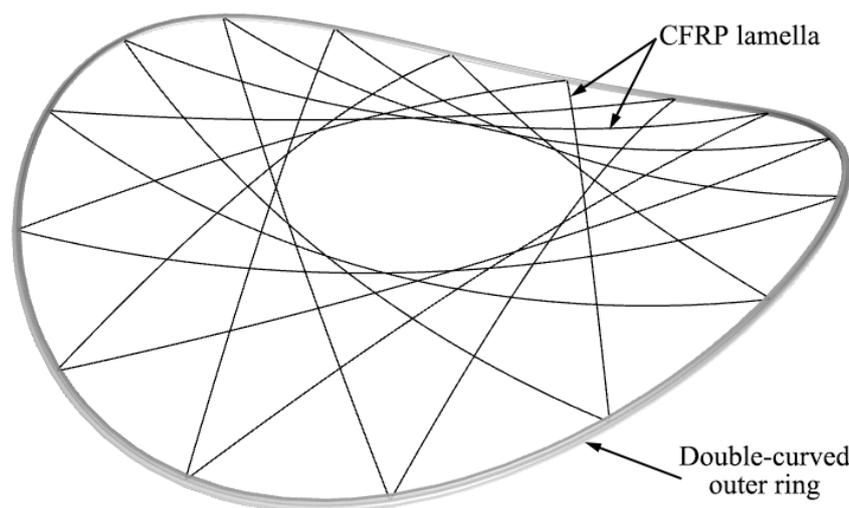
Single-layer crossover CFRP lamella cable-supported roof without inner ring
